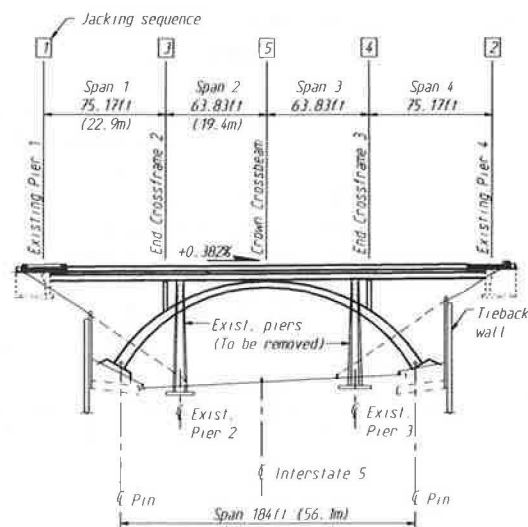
Elevation, Capitol Boulevard Bridge.
